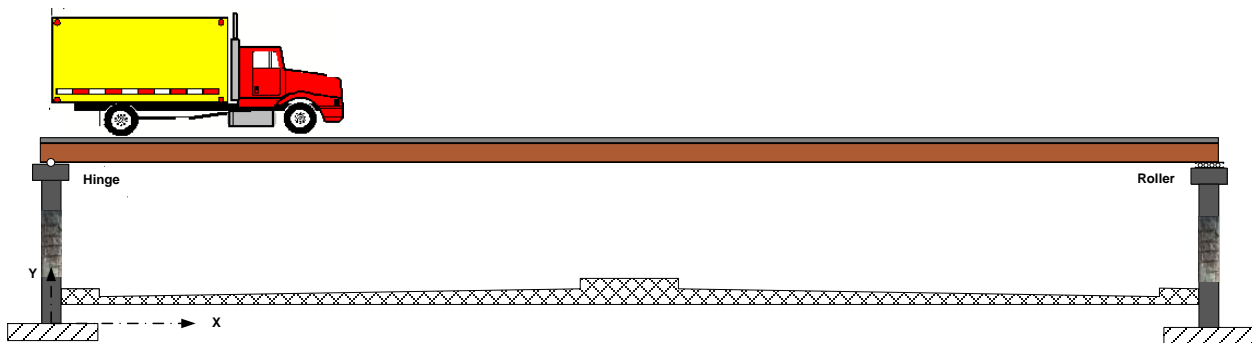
b: A truck moving on an aged slab-on-girders bridge over a highway. Possible damaged zones and boundary conditions are shown.
